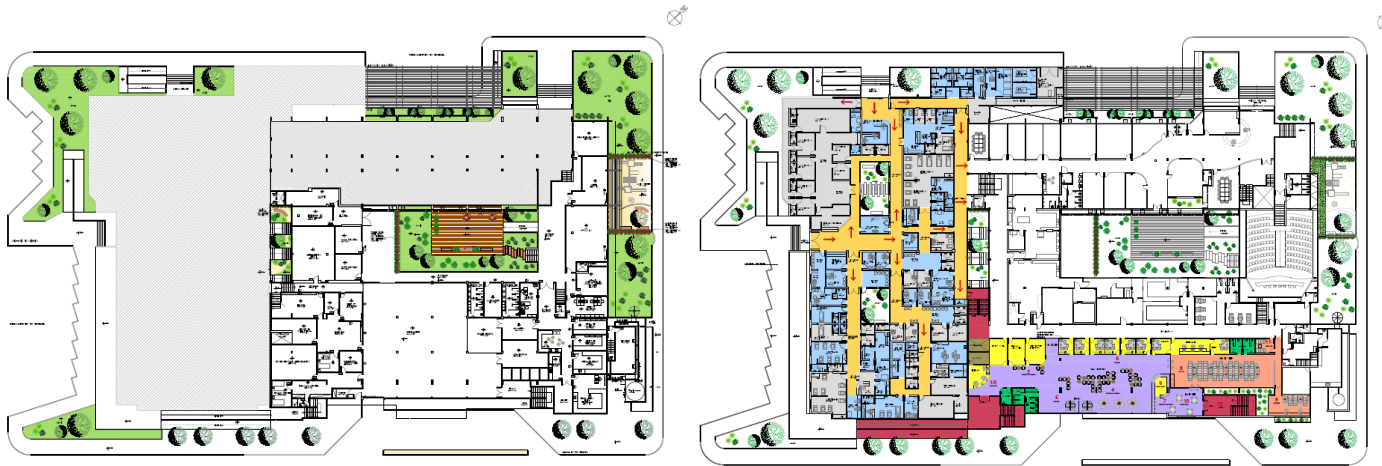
(a) Floor plan of ground level and (b) floor plan of the first level of HemoCE blood center.
